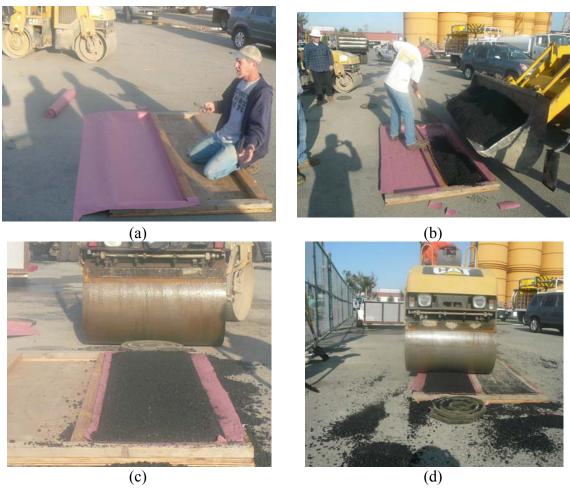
a) Slab mold fabrication b) Mixture spreading c) Compaction of the PG64-10 mixture and d) Compaction PG58-22 mixture
